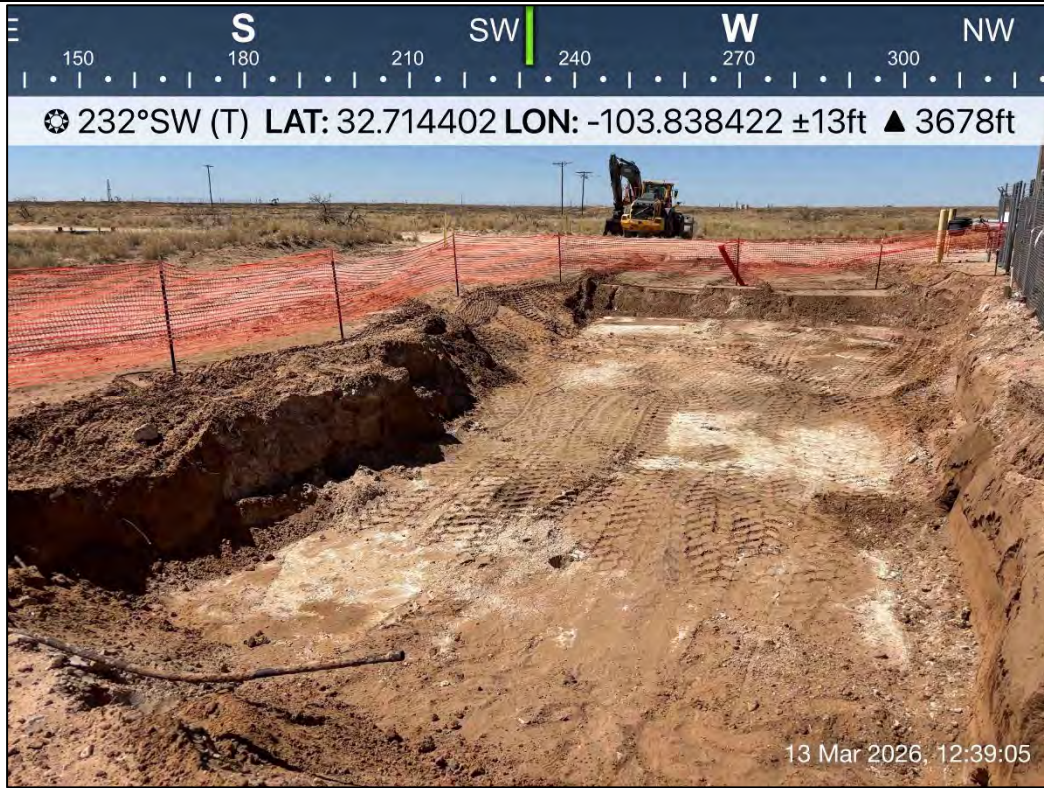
Southwestern view of excavation extent. 3/13/2026
